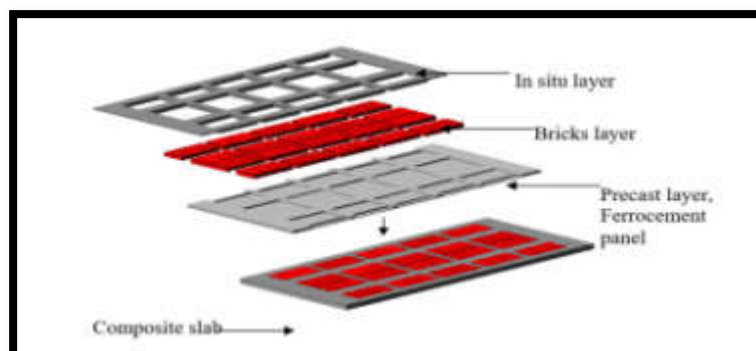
Composite ferrocement masonry slab layout [28].
